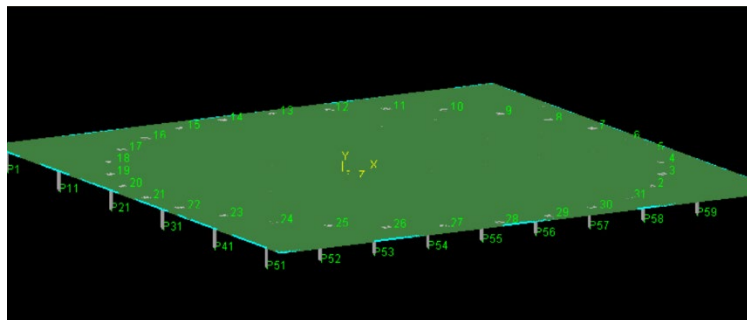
Pile raft foundation structure in STAAD foundation advanced
